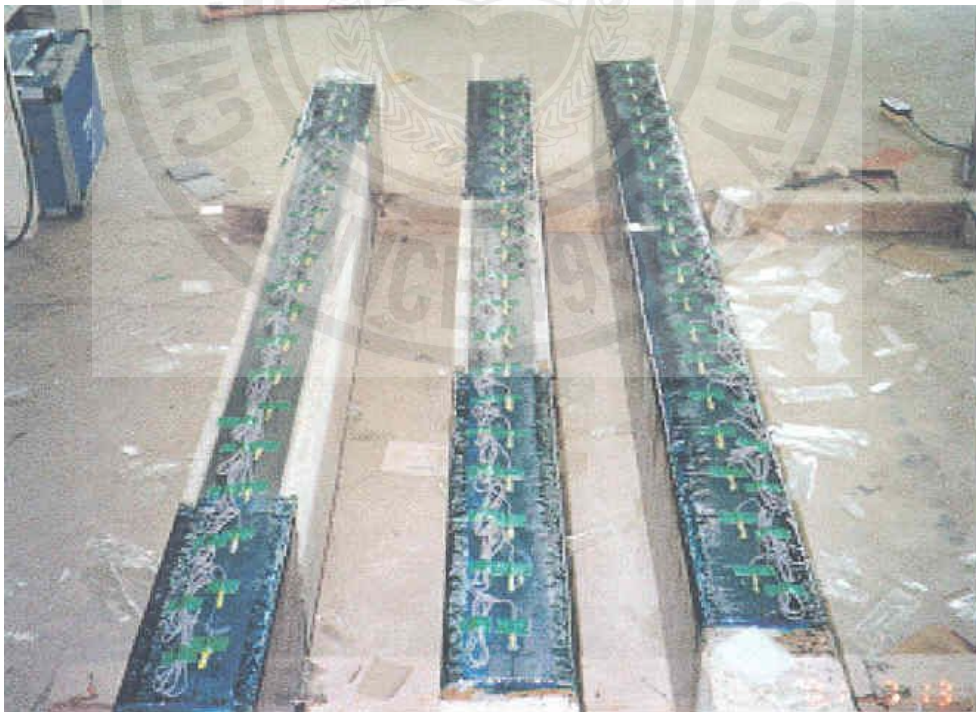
Strain gauges bonded on CFRP plate test beams
